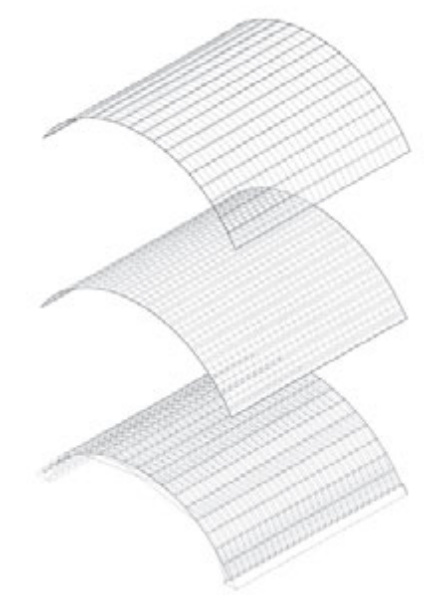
Paper Dome – layers of the structure, 1998
